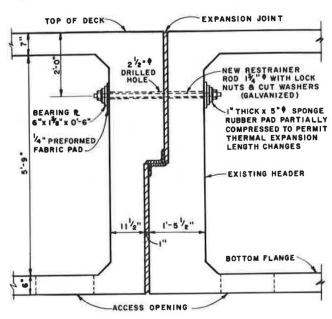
Box girder hinge longitudinal restrainer retrofit concept.
